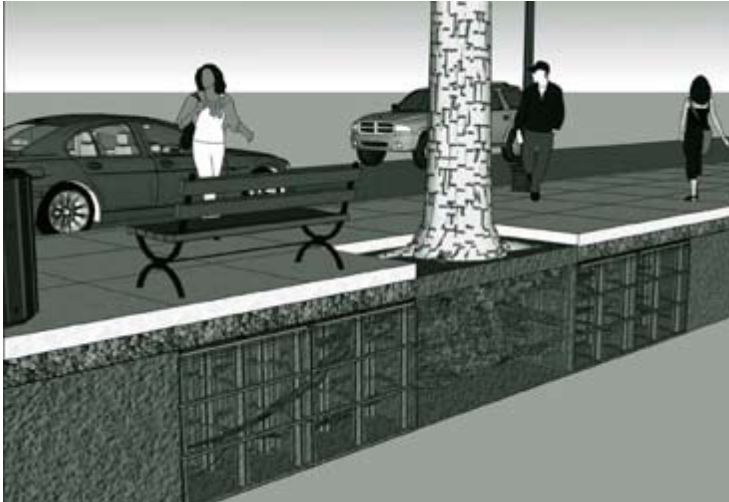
Silva cell structures support the sidewalk while providing root space for street trees
